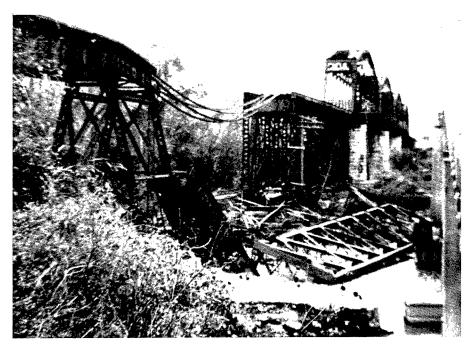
View, looking east, of collapsed railroad bridge span upstream of Missouri Highway 240 bridge, near Glasgow, Missouri.
